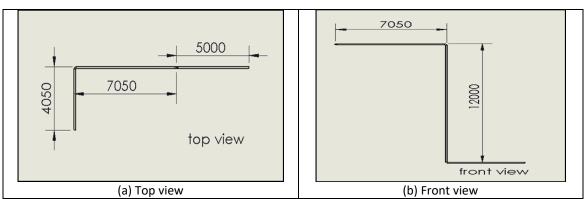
The (a) Top view and (b) Front view of the pipeline (unit in mm) design of piping system at KKTDI residential colleges
